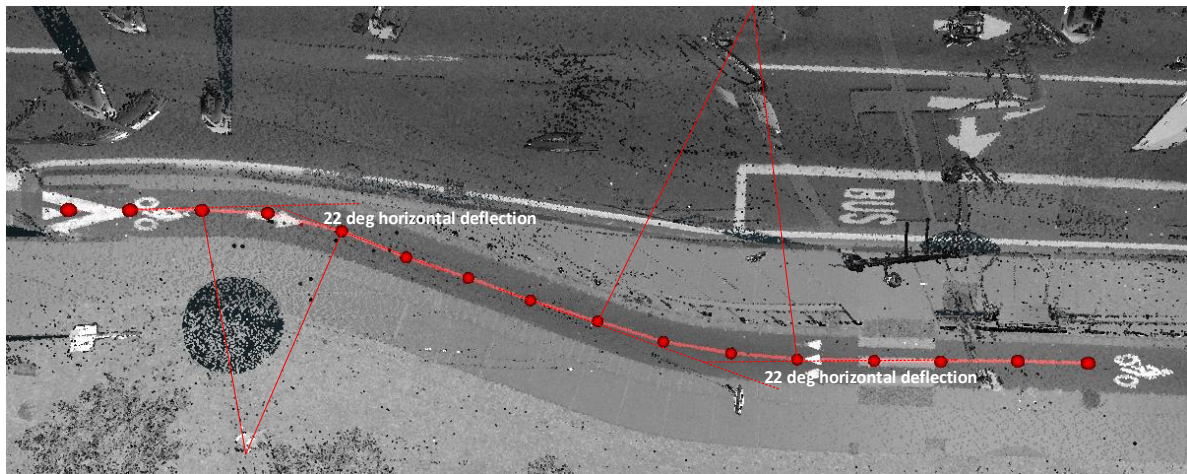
Illustration of the horizontal curve introduced the bike lane entering the bus stop at Washington Street at Walnut Street
